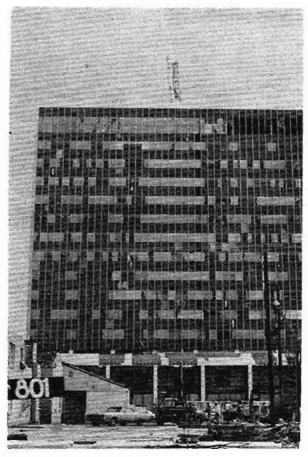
THE GREAT PLAINS LIFE BUILDING IN LUBBOCK, TEXAS WAS DAMAGED BY WINDS ON MAY 11, 1970. Although the steel frame was permanently deformed, the fully engineered building has been restored to useful service.
